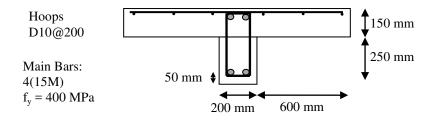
Cross Section of Beams in the Secondary Frames.
